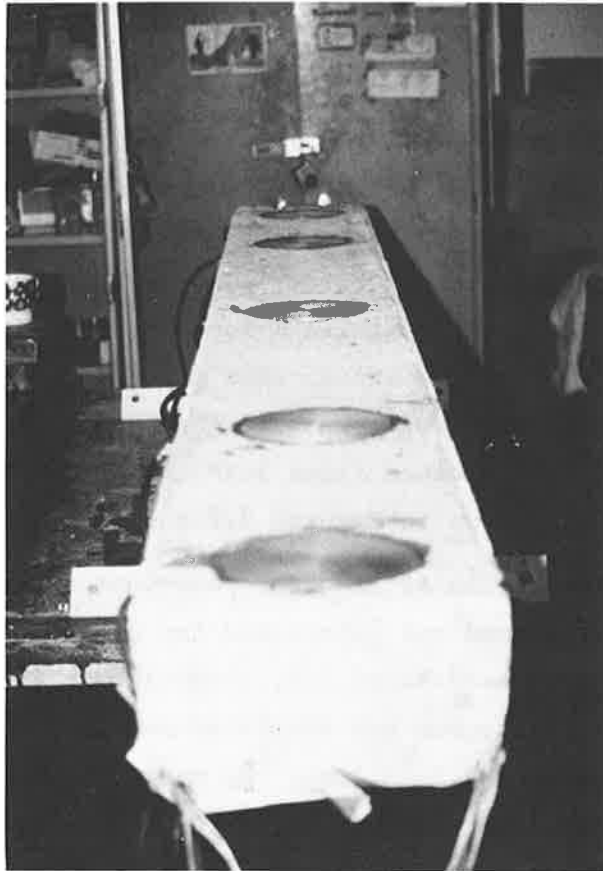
SOIL PRESSURE GAGES AND BEARING PLATES INSTALLED IN CROSSTIE BOTTOM SURFACE
